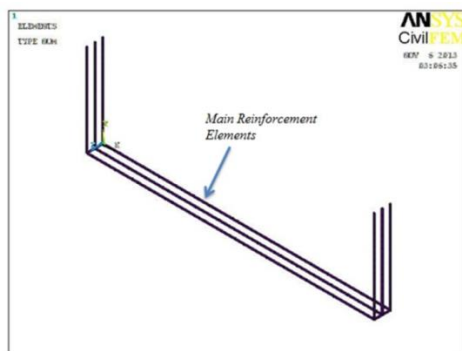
Typical Finite Element model and Elements used for the Steel Reinforcement
